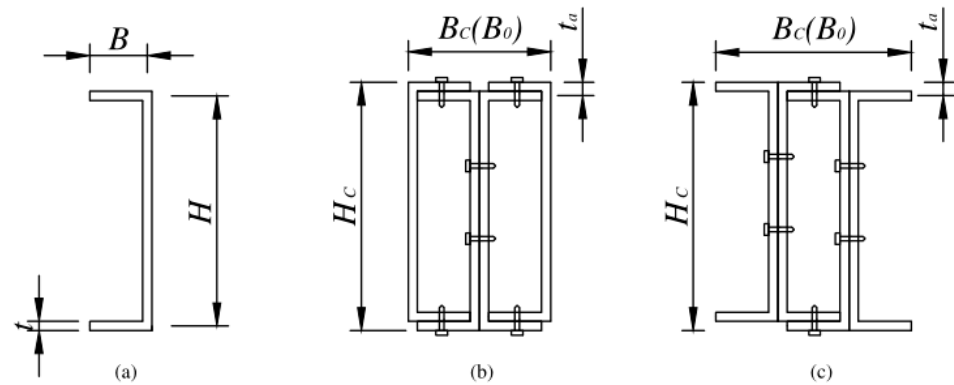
Schematic of members and specimens. (a) U-shaped CFS; (b) B4 cross section; (c) K4 cross section (Unit: mm).
